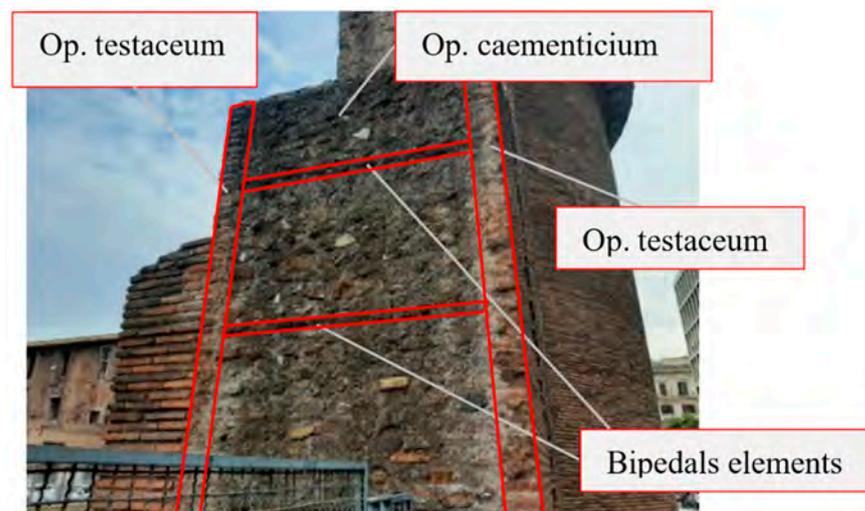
Section of masonry Wall fragments of *Gymnasium* (WG).
